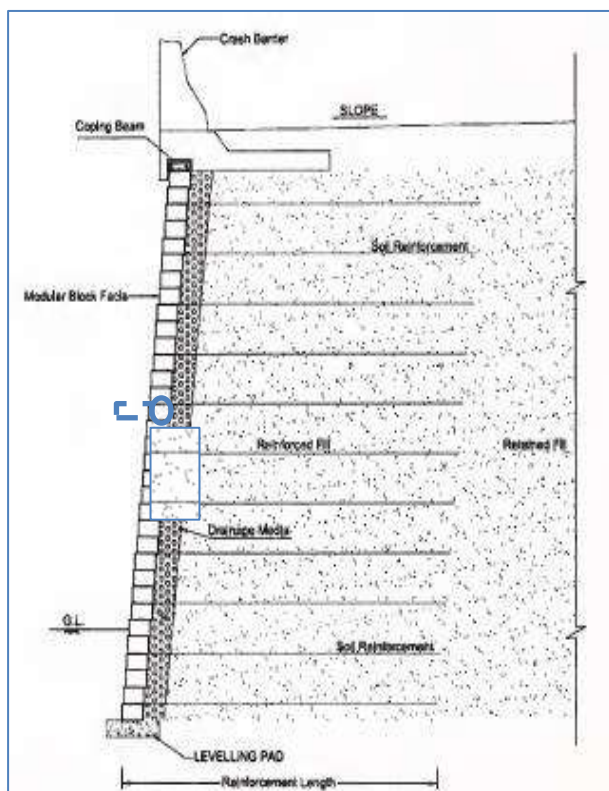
Typical Cross Section of RS Wall with Modular Block Facia
